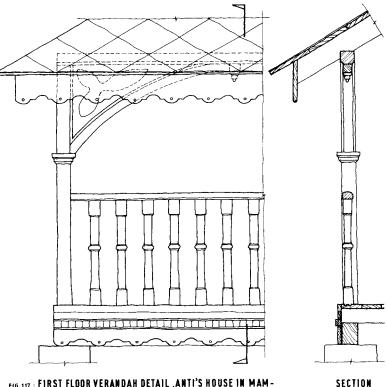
FIRST FLOOR VERANDAH DETAIL ,ANTI'S HOUSE IN MAM-PONG , AKWAPIM . FNOM MEASUNED ORAWINGS, DEPARTMENT OF ARCHITEC-TURE, N.S.T. , 1969 . NOT TO SCALE.
